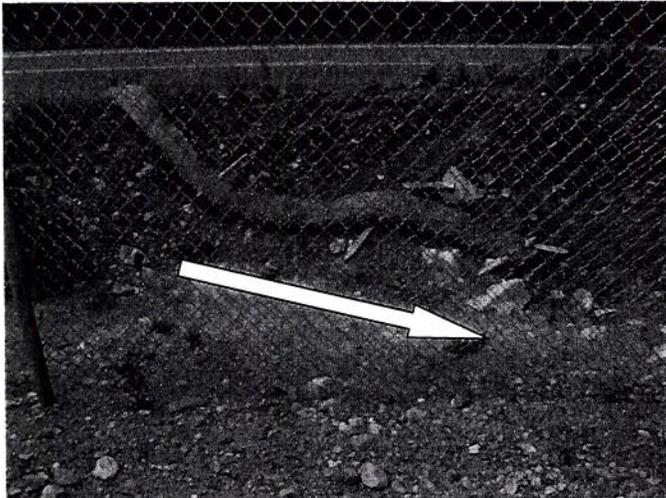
Erosion straw wattle along the western side of the construction boundary are not trenched and are not staked. The stormwater drains to the north, as indicated by the arrows, to roadside drainage ditch.
